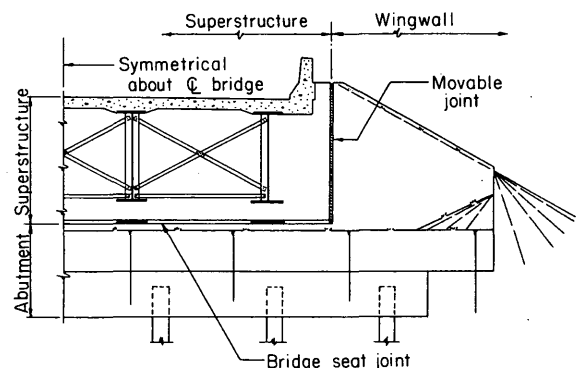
Semi-integral abutment with transverse wingwalls.
